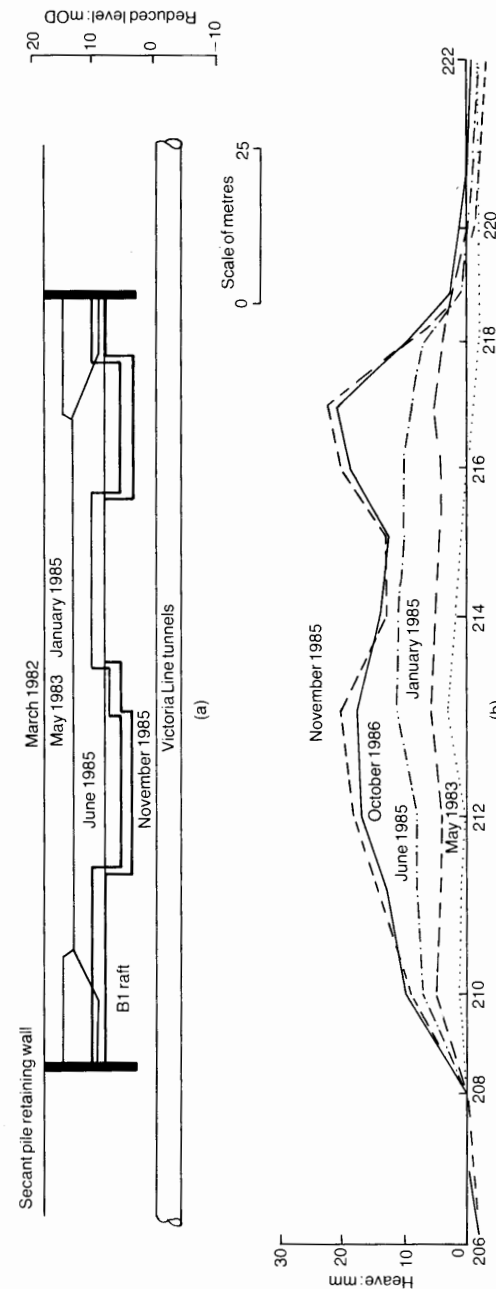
Tunnel movements: (a) east-west section; (b) heave profile along line of tunnel
